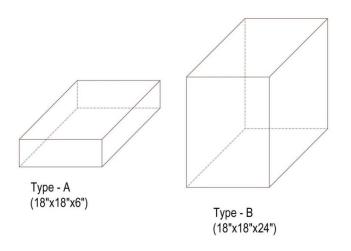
Three Dimensional View of RCC Block (Heavy and Light)
